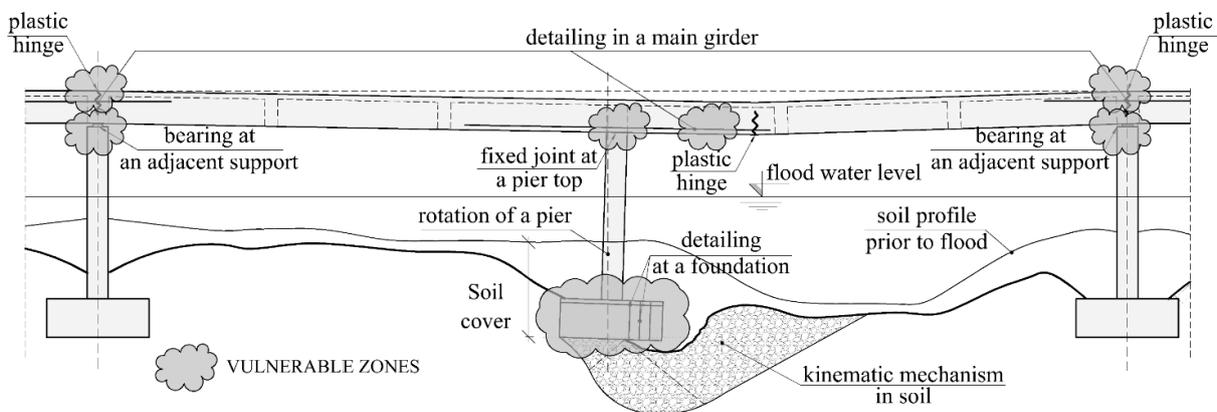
An example of a failure mode due to local scour at a pier - multiple-span RC girder bridge and its vulnerable zones - adapted from Tanasic & Hajdin, 2017
